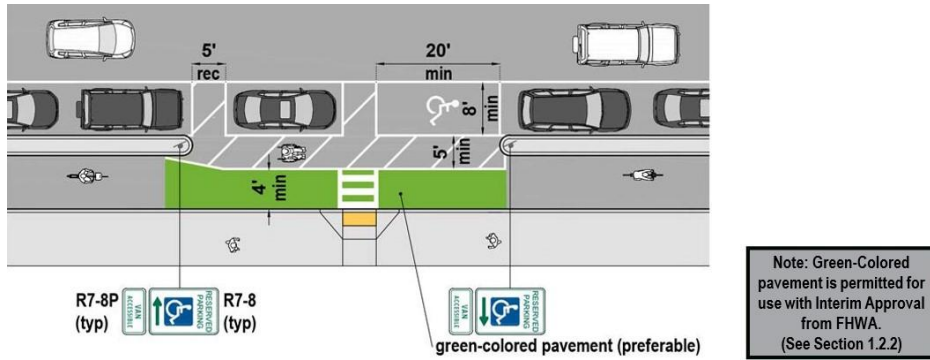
Example of Accessible Mid-block On-Street Parking
